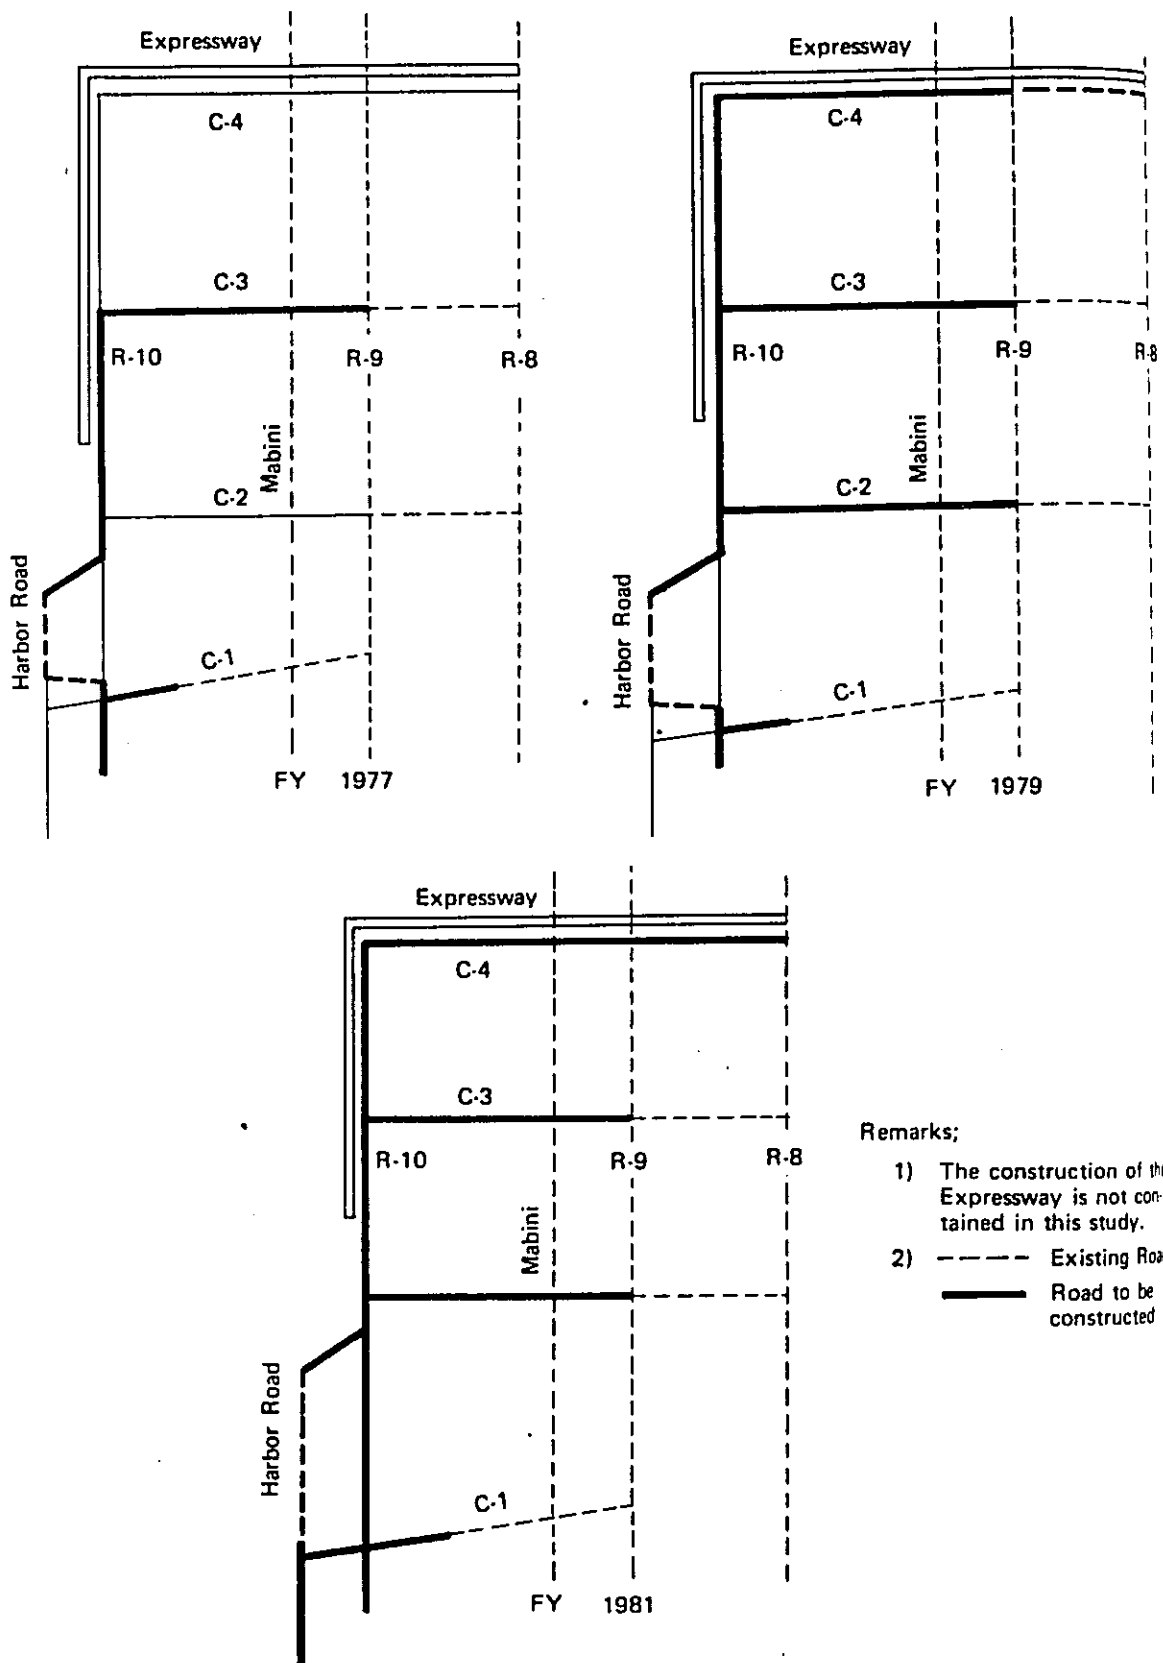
STAGE CONSTRUCTION PLAN OF PROJECT ROADS
